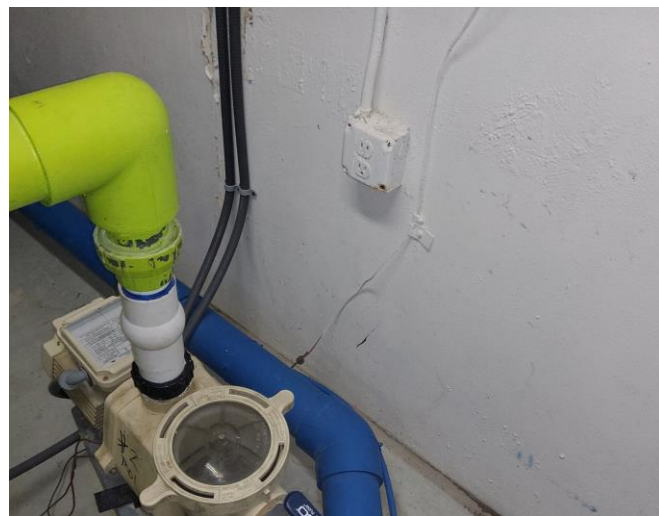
Item 26.e. Pool Pump Room. Missing GFCI protection for receptacles.
